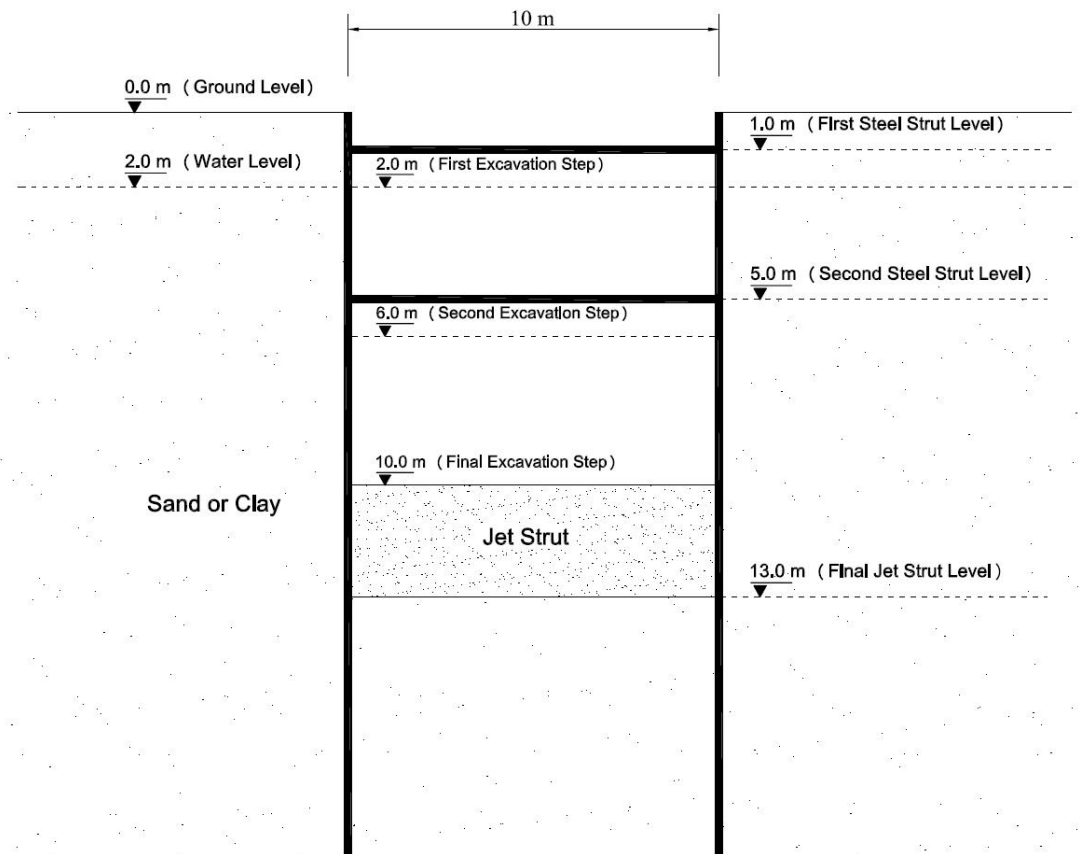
Jet Grouting Strut Location II: Jet struts between 10.0 m and 13.0 m
